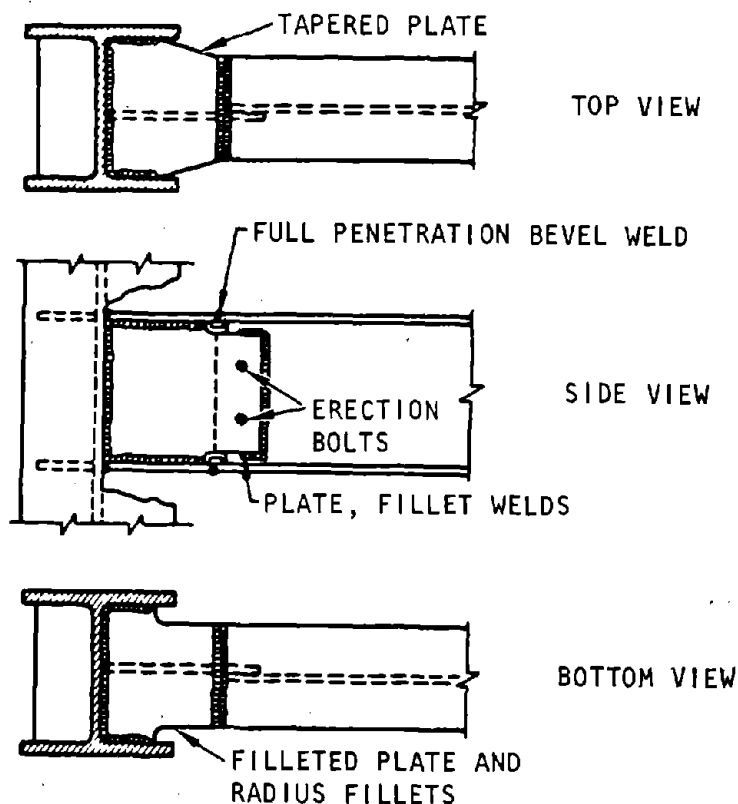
Alternative Beam-Column Connection, Type V (Popov-Pinkney, 1968)
